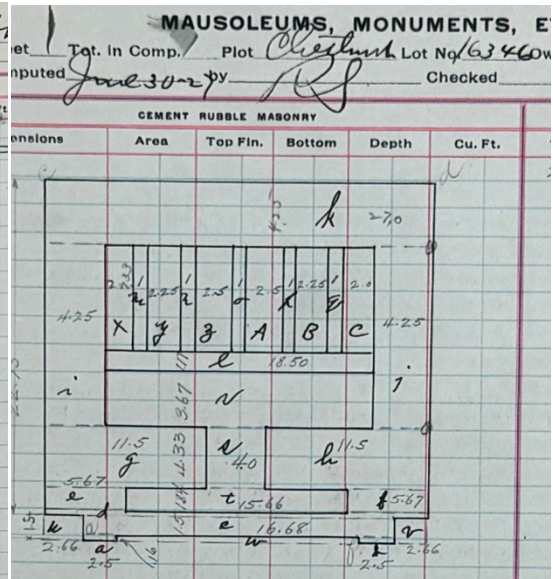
, Catacombs Plan, Avery Drawings and Archives Collection
